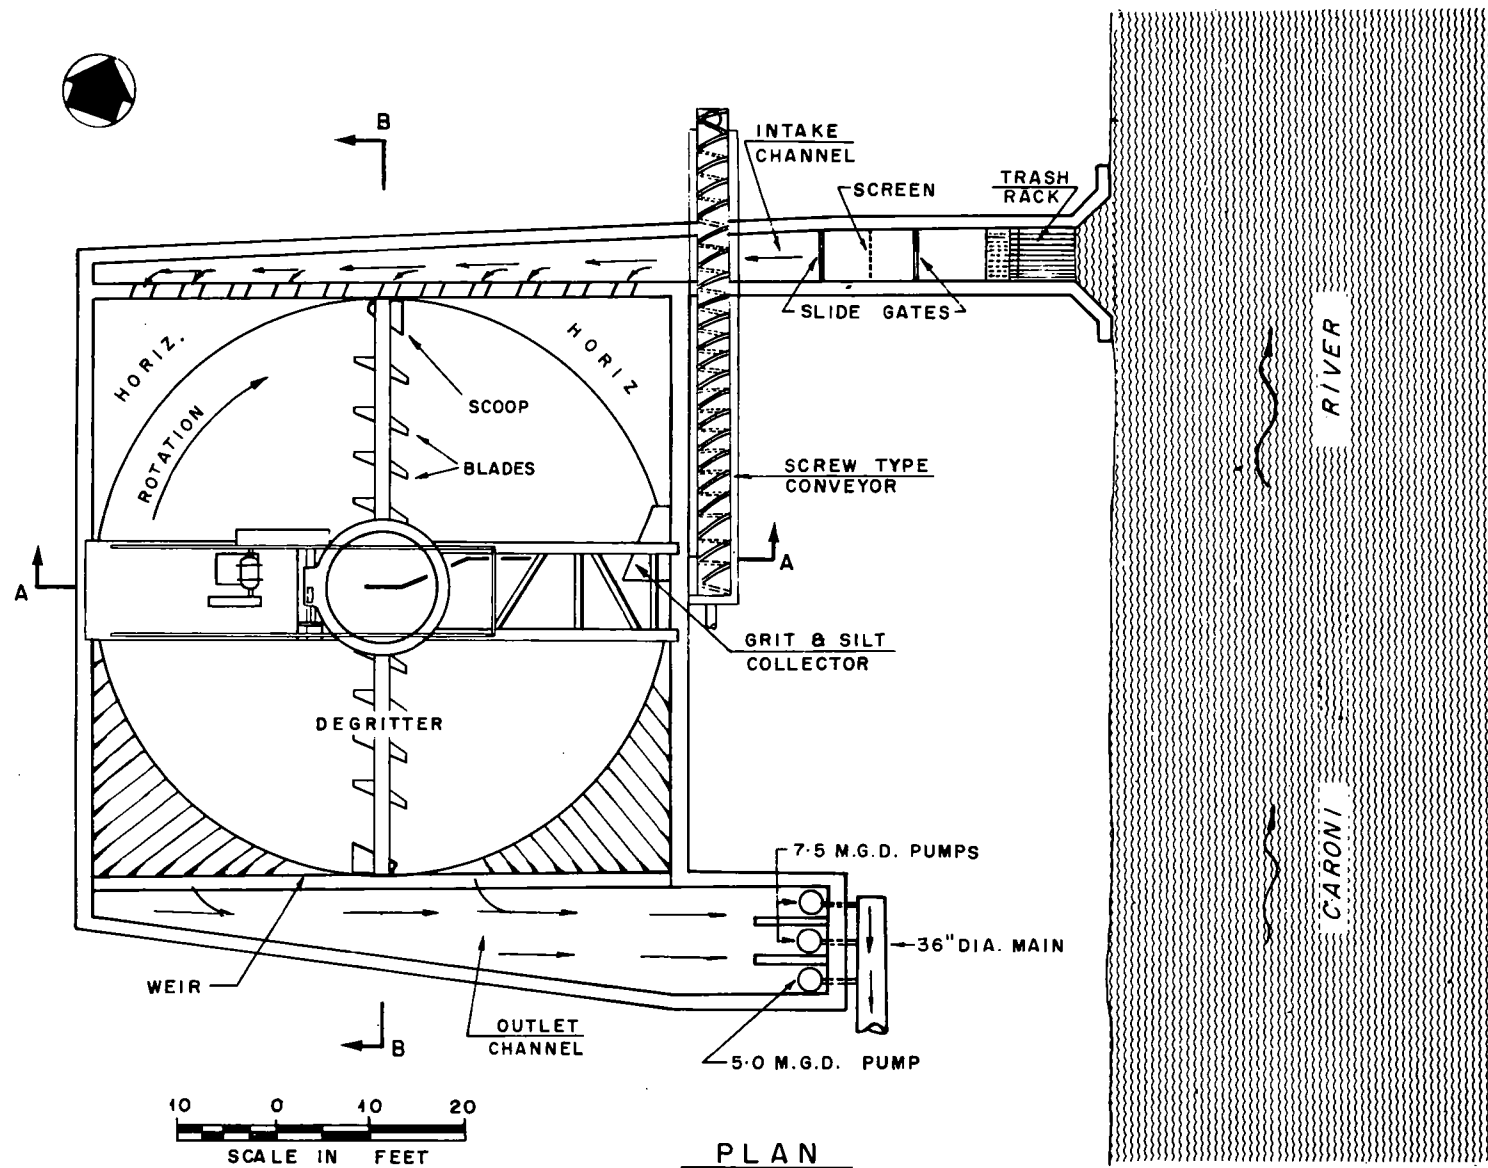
SAN RAFAEL DEGRITTER – PLAN
